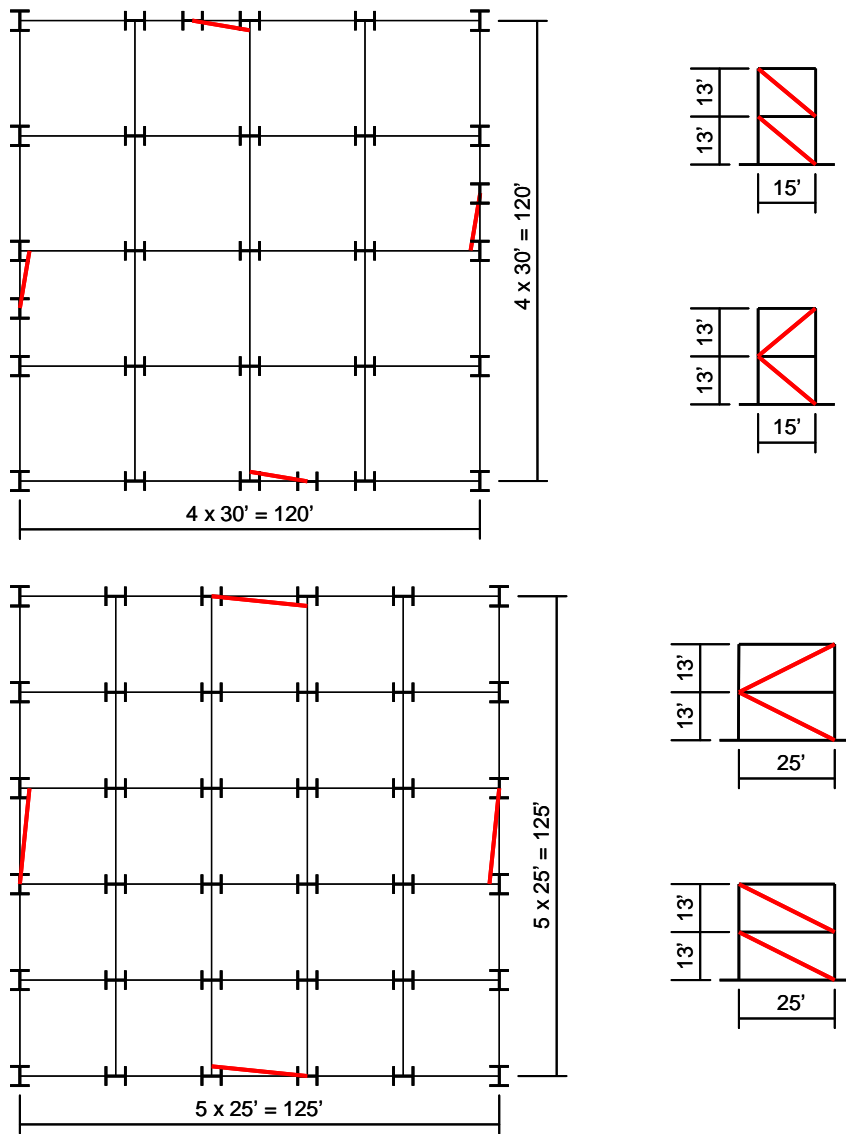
Plan configurations for ZZ- and LB-diagonal brace configurations illustrated for 2-story archetypes with bay widths of 15 feet and 25 feet.
